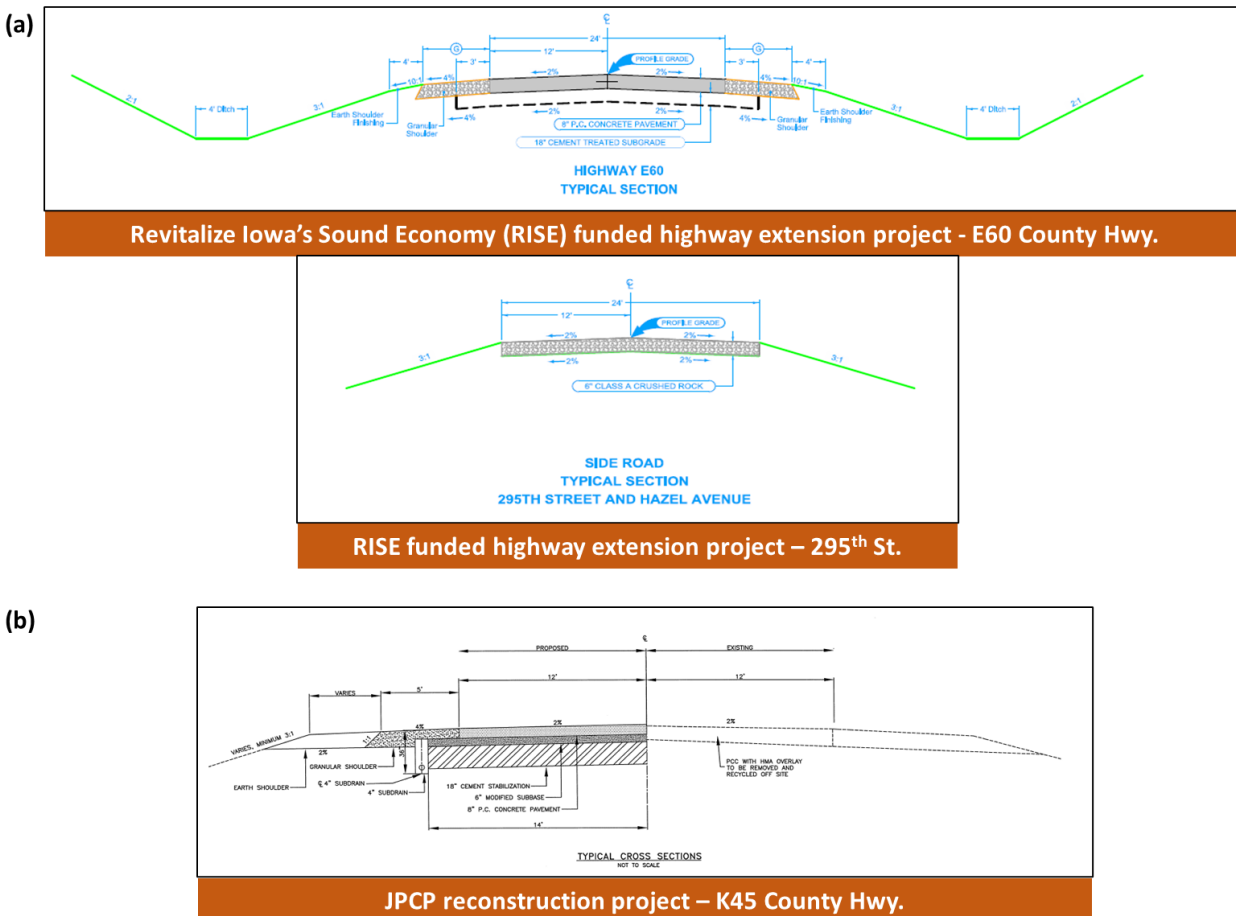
Proposed cross-sectional structural information of reconstruction projects on (a) E60 and 295th Street and (b) K45 scheduled for October 2021 and July 2021, respectively
